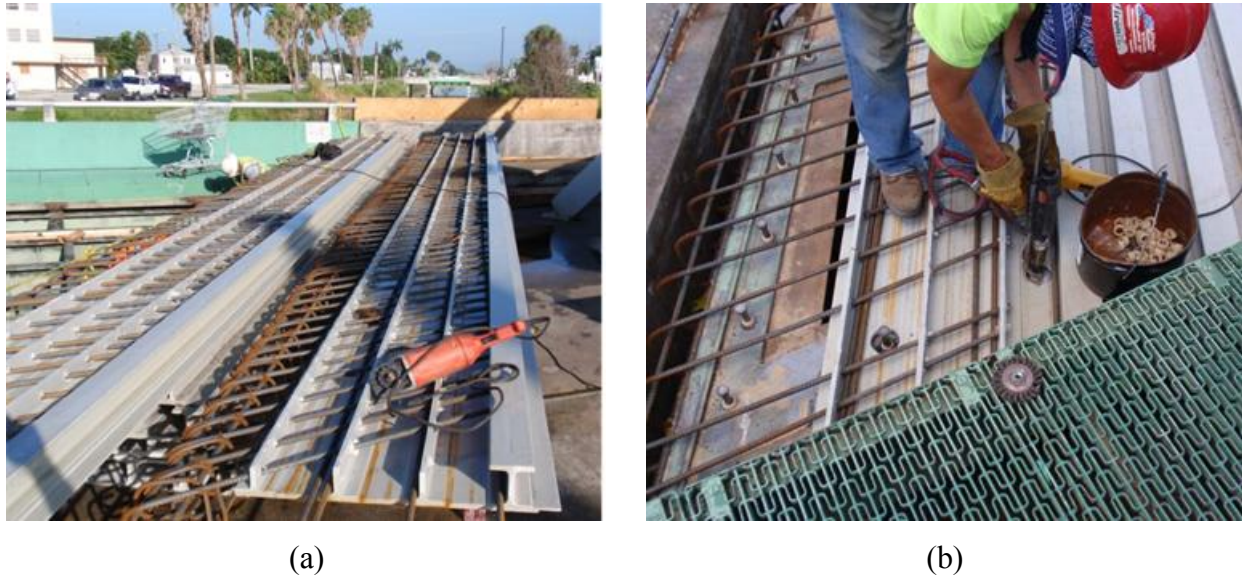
Transition between GFRP deck and concrete deck (a) reinforcement for cast-in-place concrete (b) installation of welded headed stud
